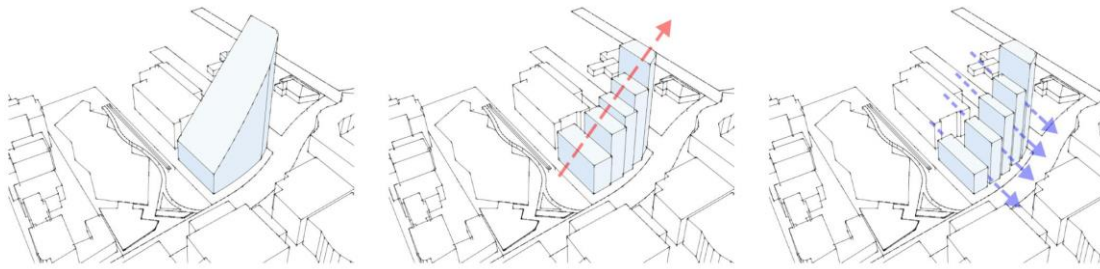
Scaling and design context for the winning Design Excellence Competition design showing a building designed to minimise overshadowing to Jubilee Park.
